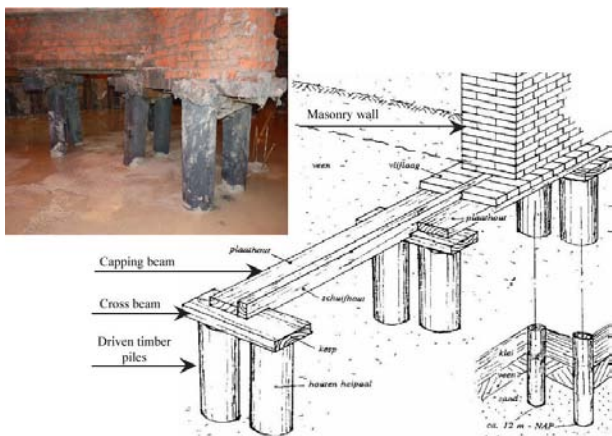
Typical Amsterdam foundation (Zantkuijl 1993)
